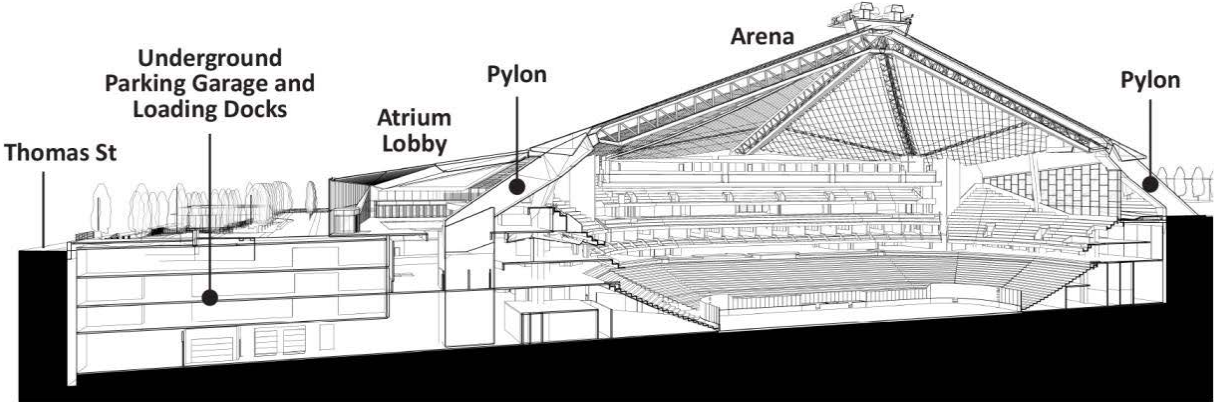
Cross Section – Showing Arena and Parking Garage
